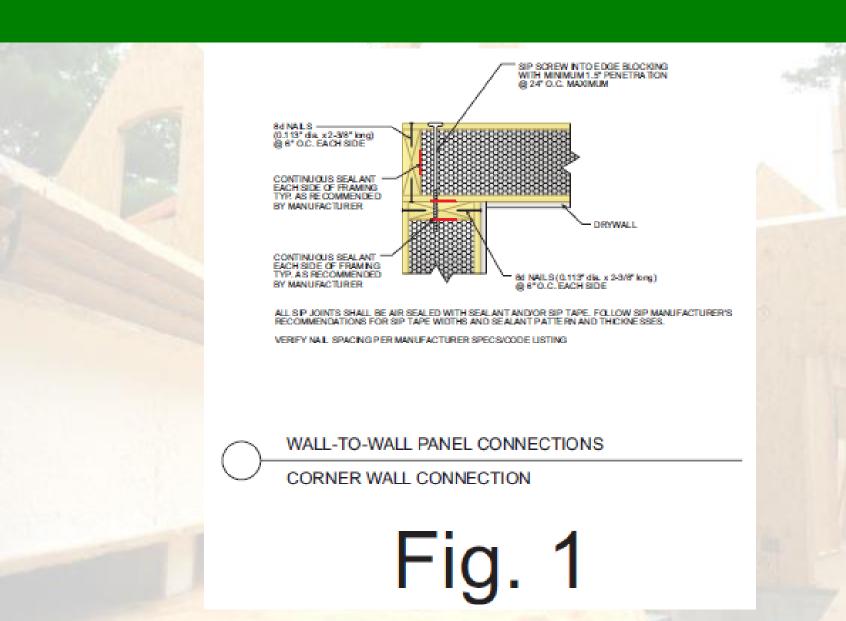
Wall-to-Wall	Panel	Connections:	Corner	wall	Connection
